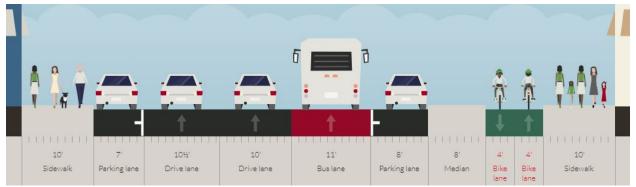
Typical Cross Section of Folsom Street between 6<sup>th</sup> Street and 5<sup>th</sup> Street, looking east
